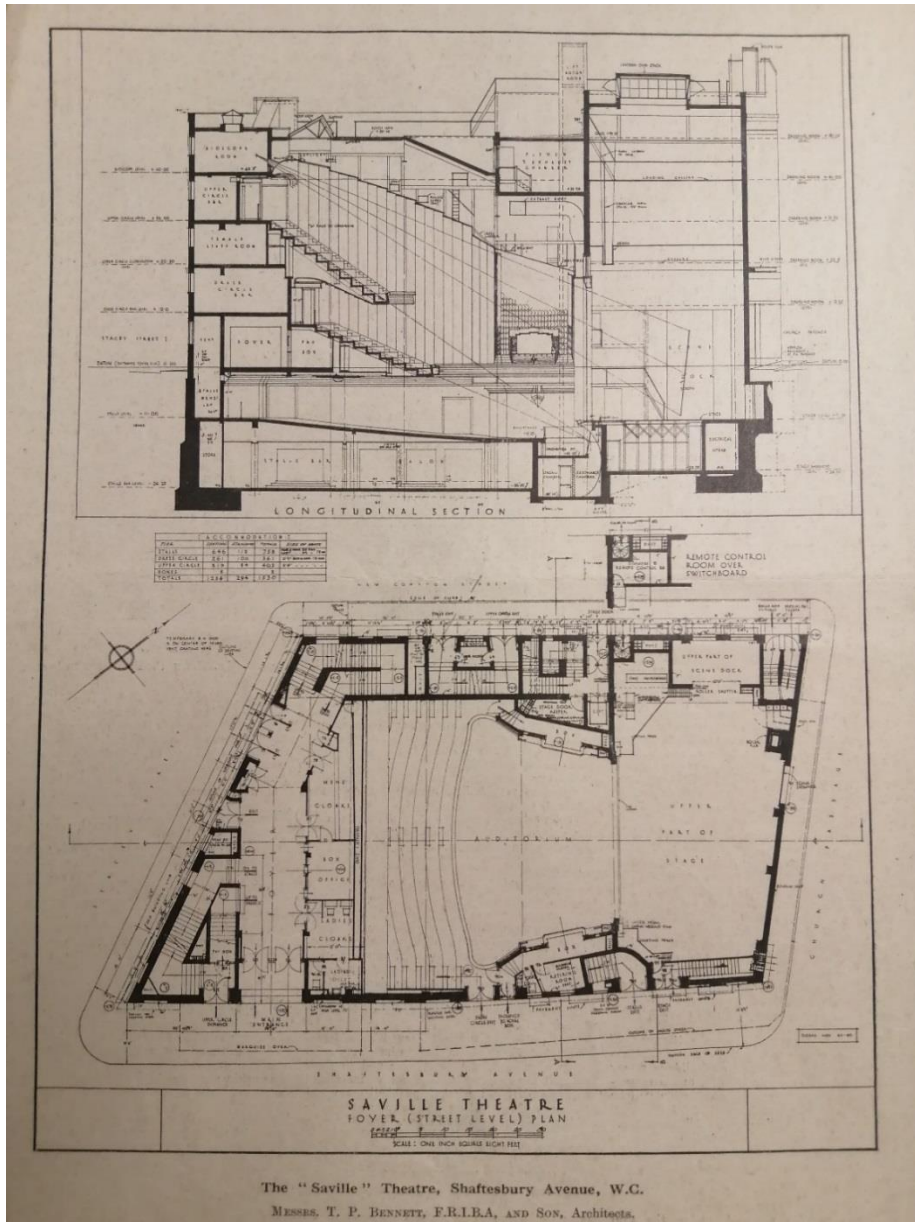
Original section and ground floor plan of the theatre. Source: Architects Journal.
